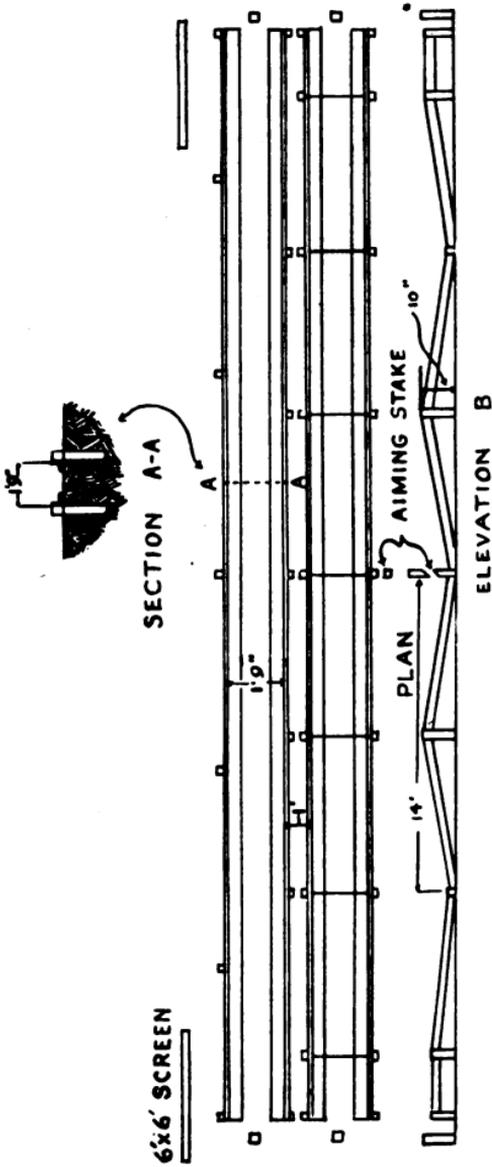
Dimensions and plan of construction, 1,000-inch range.
